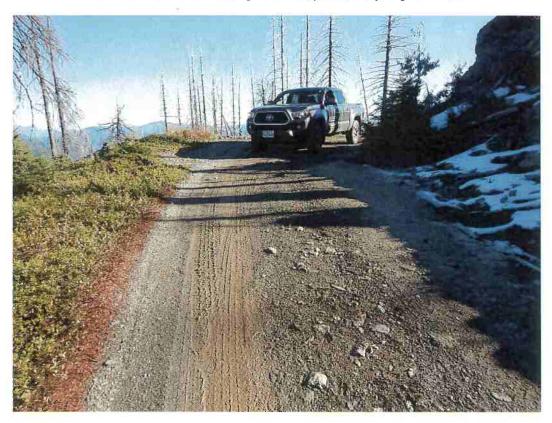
RP 13. Vehicle traveling north-west, photo taken facing south-east.
